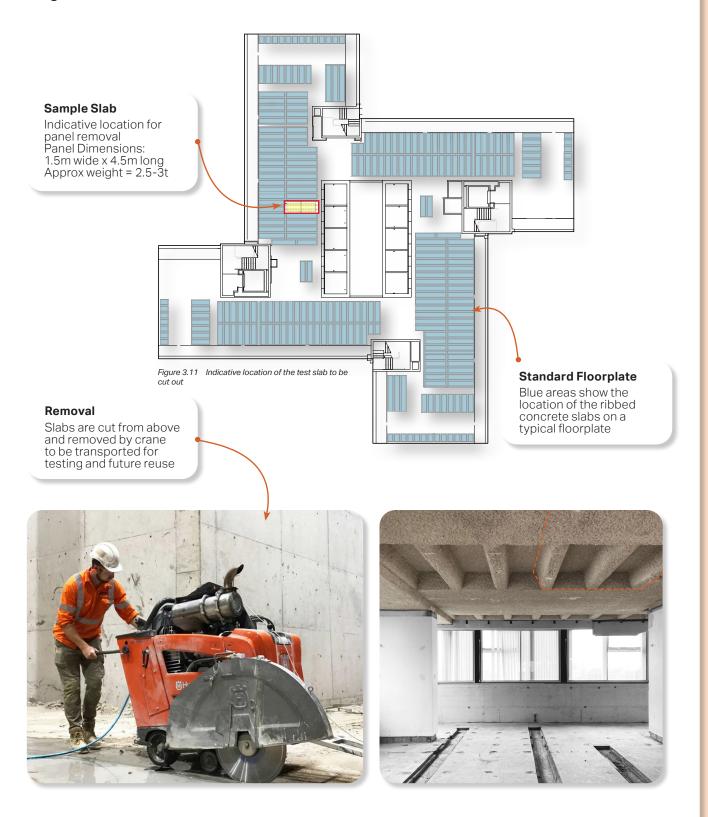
Reference photo for cutting of in-situ concrete elements
